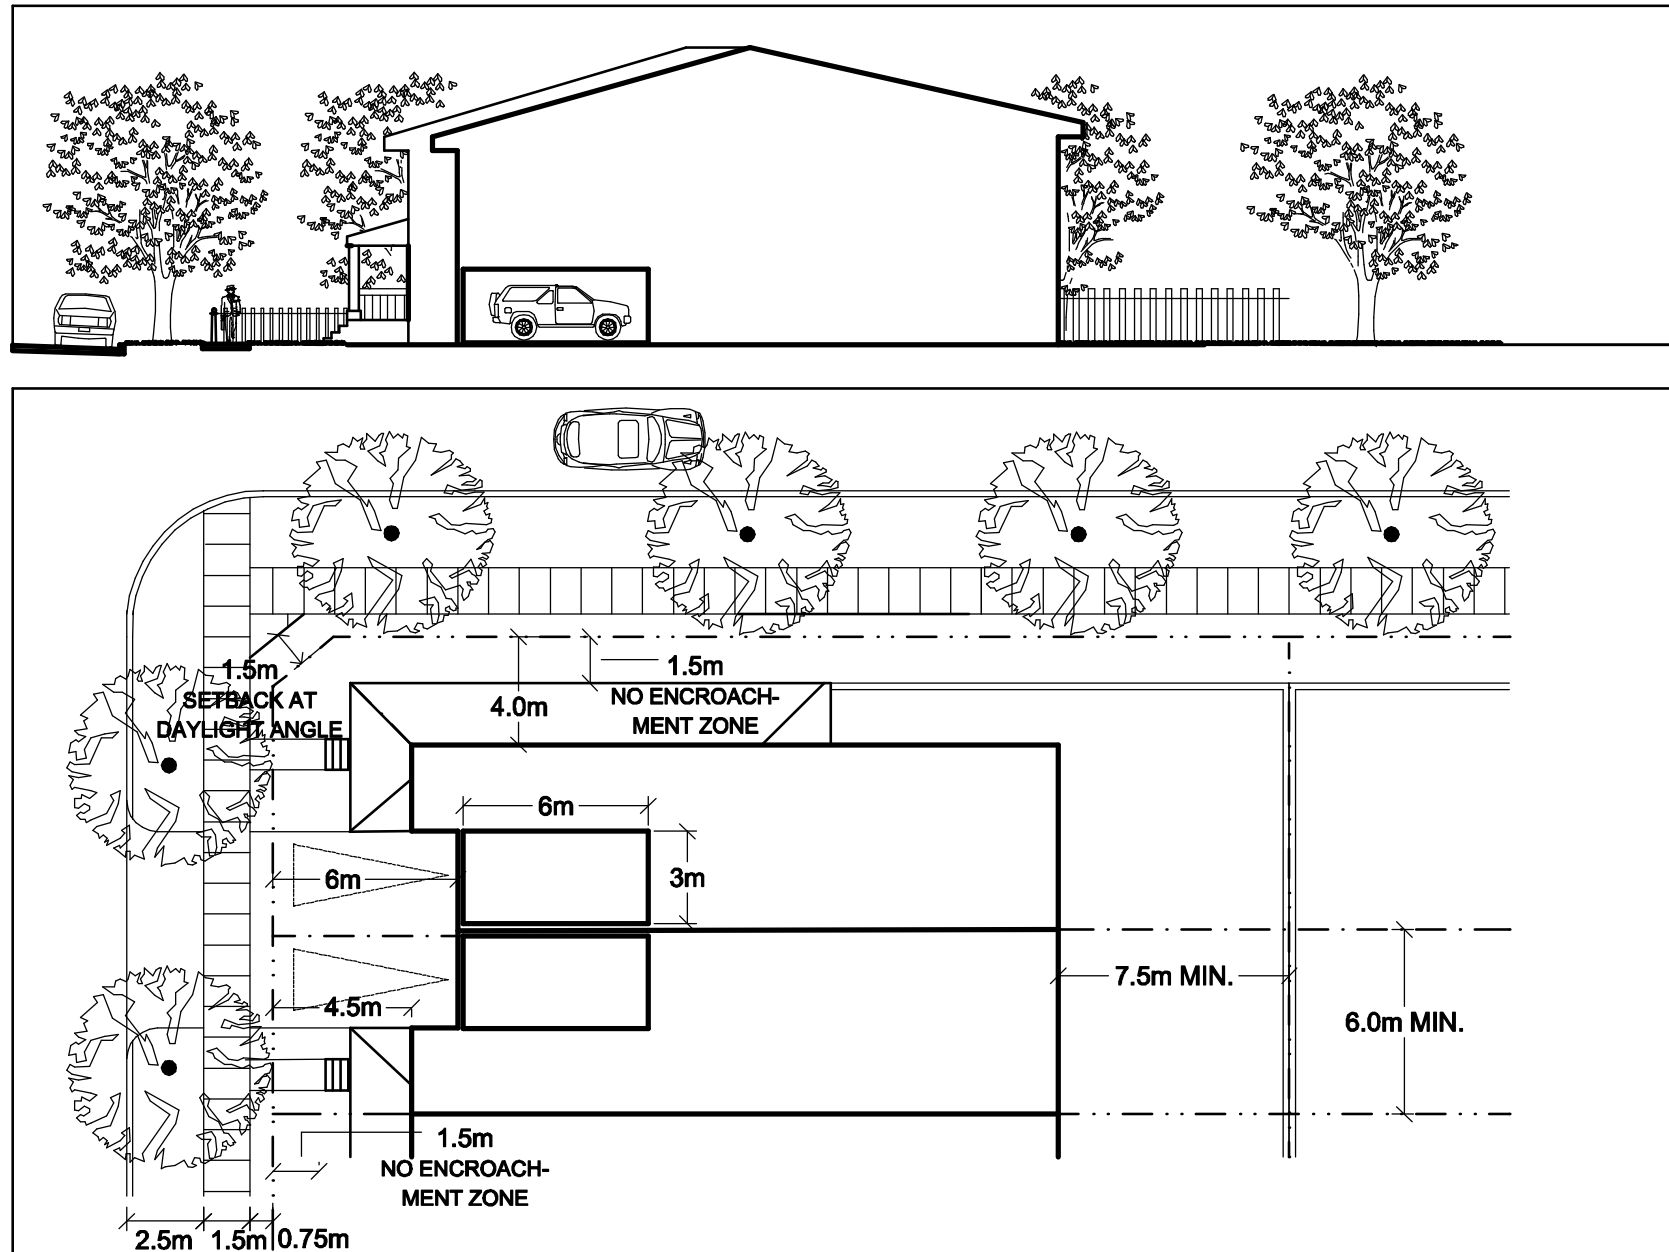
Flankage lot adjacent to greenway of a Row house with attached garage
